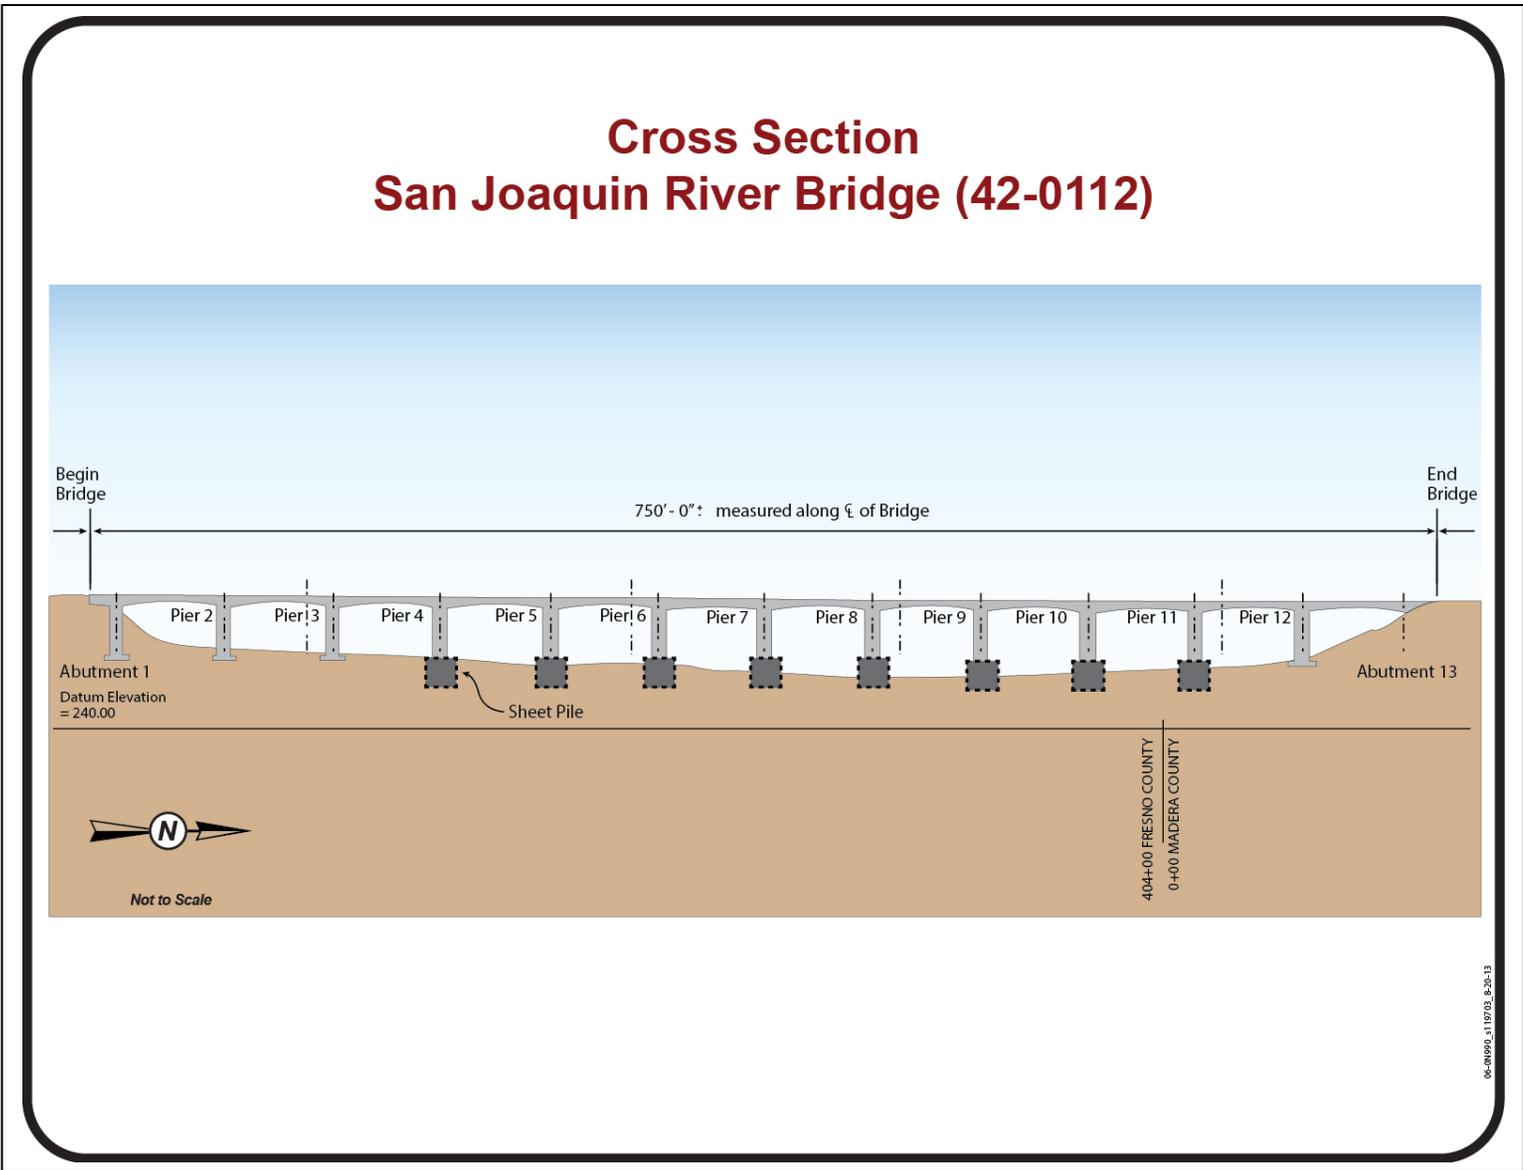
Cross-section of San Joaquin River Bridge (No. 42-0112) Showing Sheet Piles
